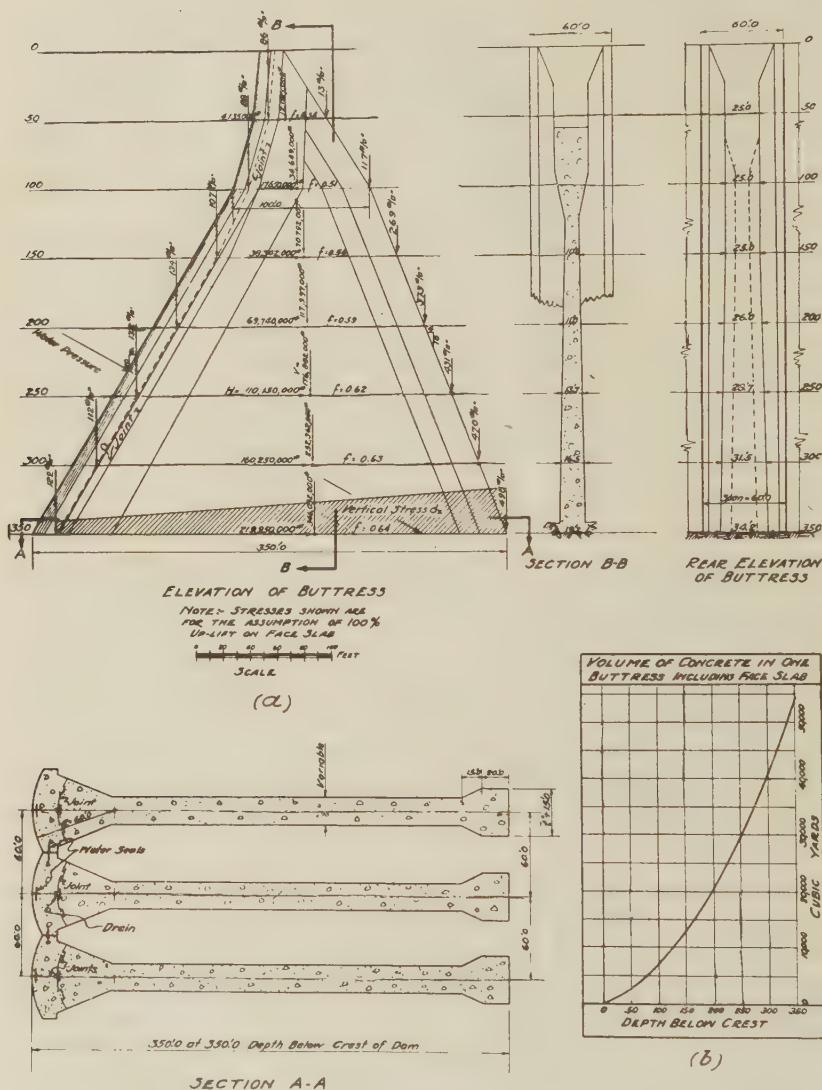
TYPICAL DESIGN FOR 60-FT. SPACING OF BUTTRESSES
